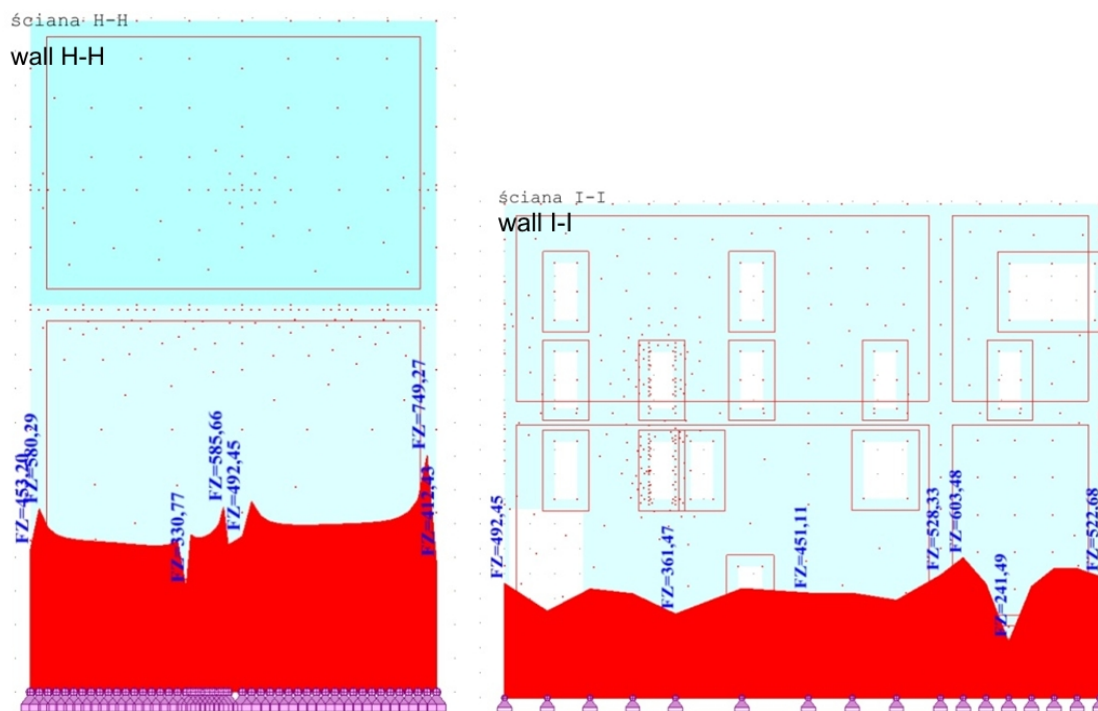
Subsoil reaction under the walls H-H and I-I (wall loads shown in kN/m)
